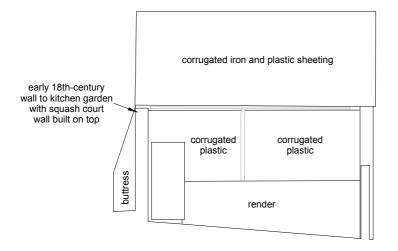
Structure 14, 1886-98 squash court south-west elevation.
